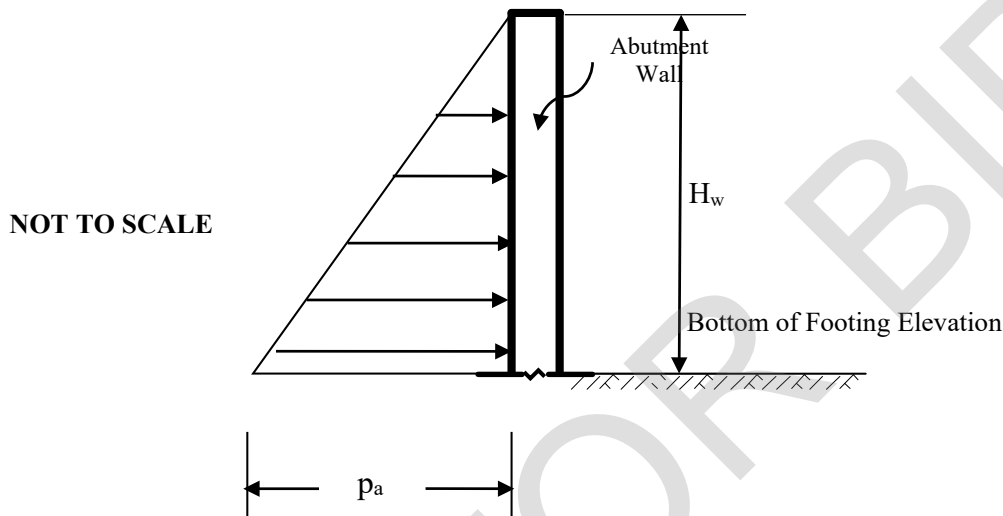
Loading Diagram of Geostatic Pressures on Abutment/Wing Wall
